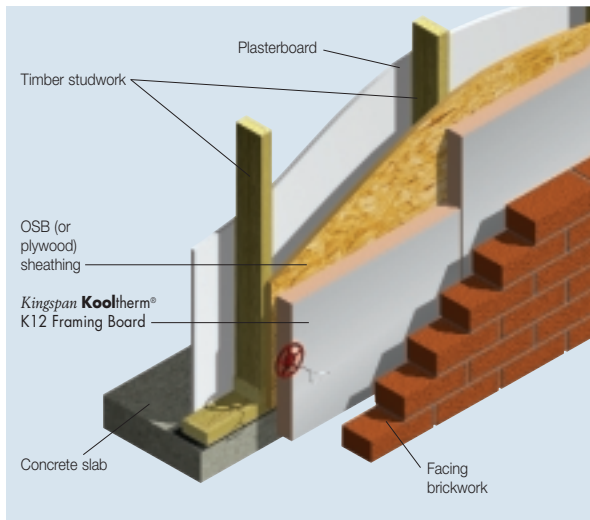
Brick Faced Timber Frame Wall (Insulating Sheathing)
